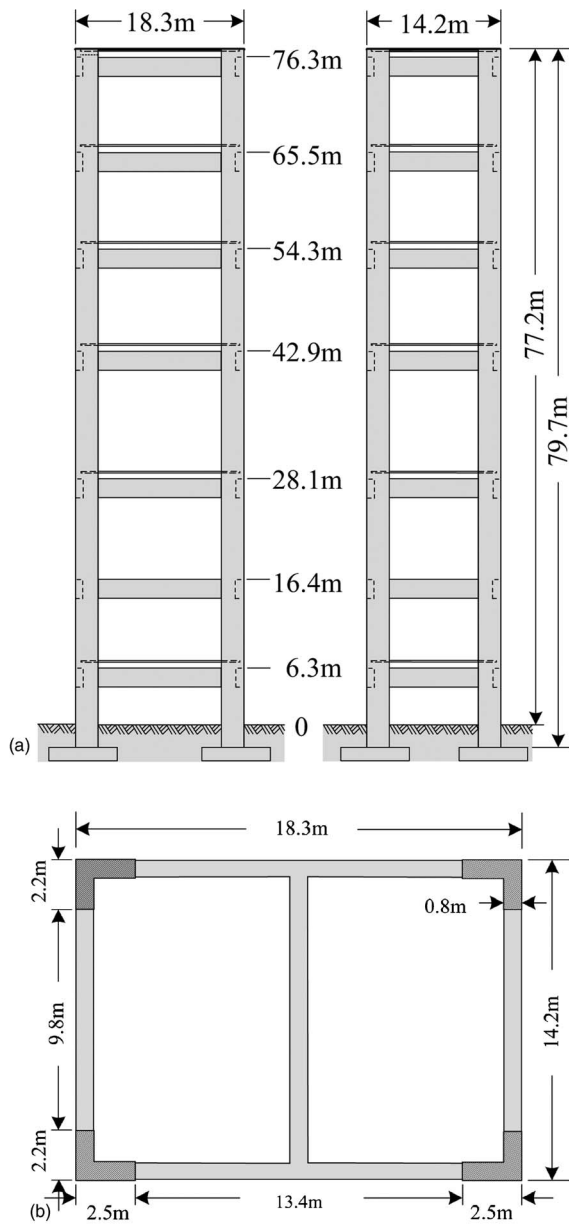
Typical structural layout of cement plant preheater tower: (a) elevation; (b) floor plan
